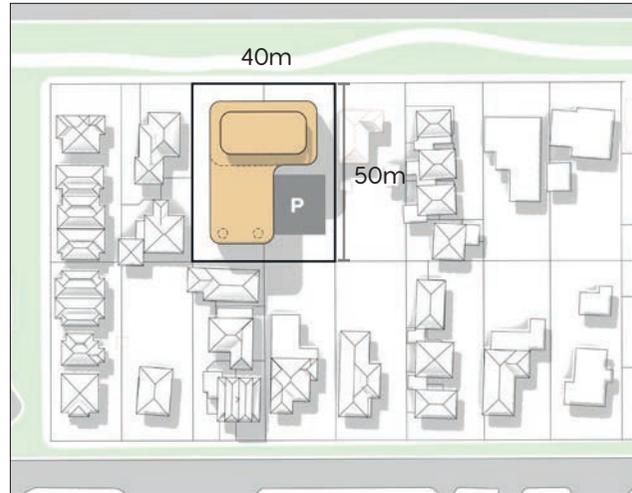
Plan view: Typical scenario for parcel consolidation of 2 residential lots
